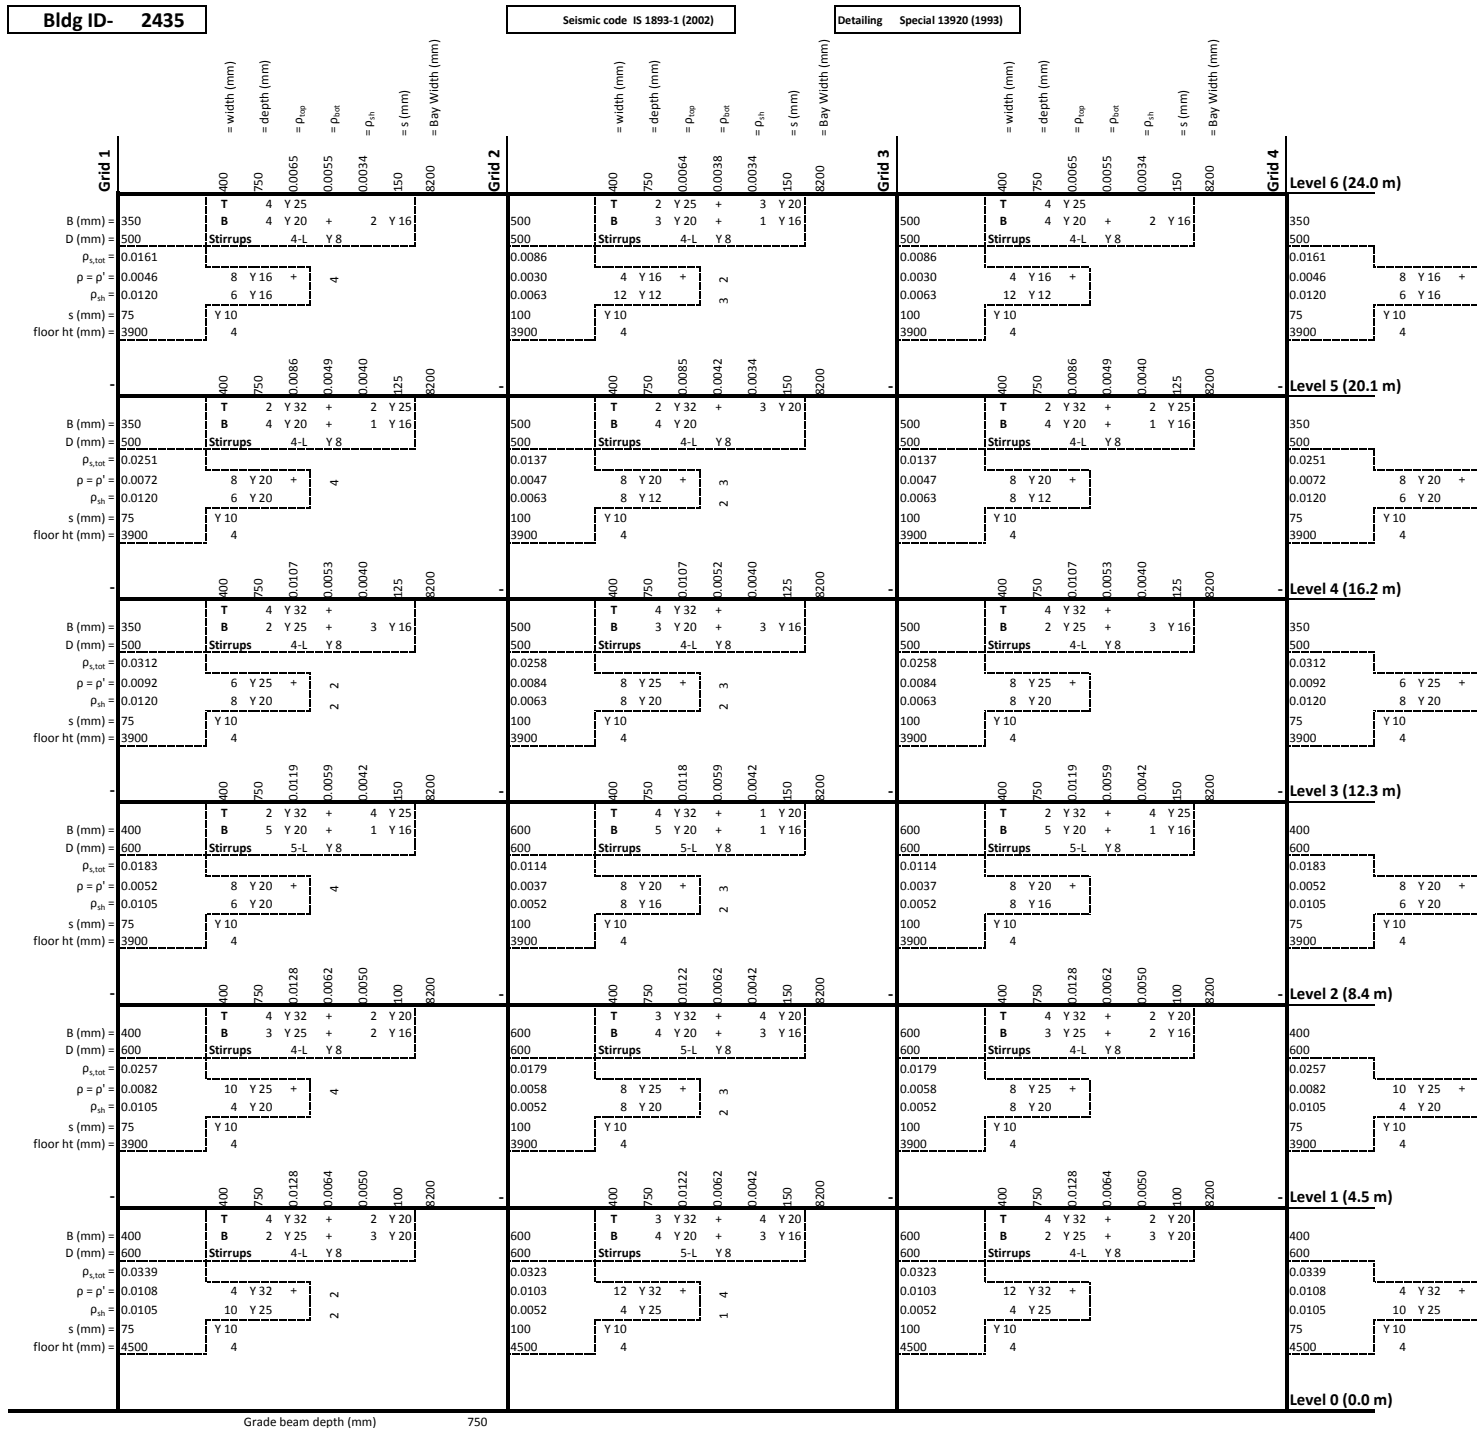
Provided reinforcement and modeling details for building ID 2435
